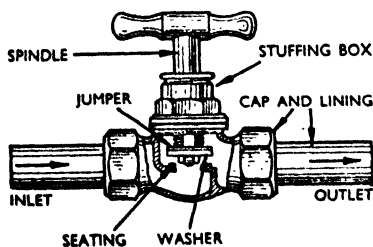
Screwdown stop cock for controlling downservice pipes at point of connection to storage cistern. Branches to fittings should be controlled in a similar manner to facilitate repairs.
